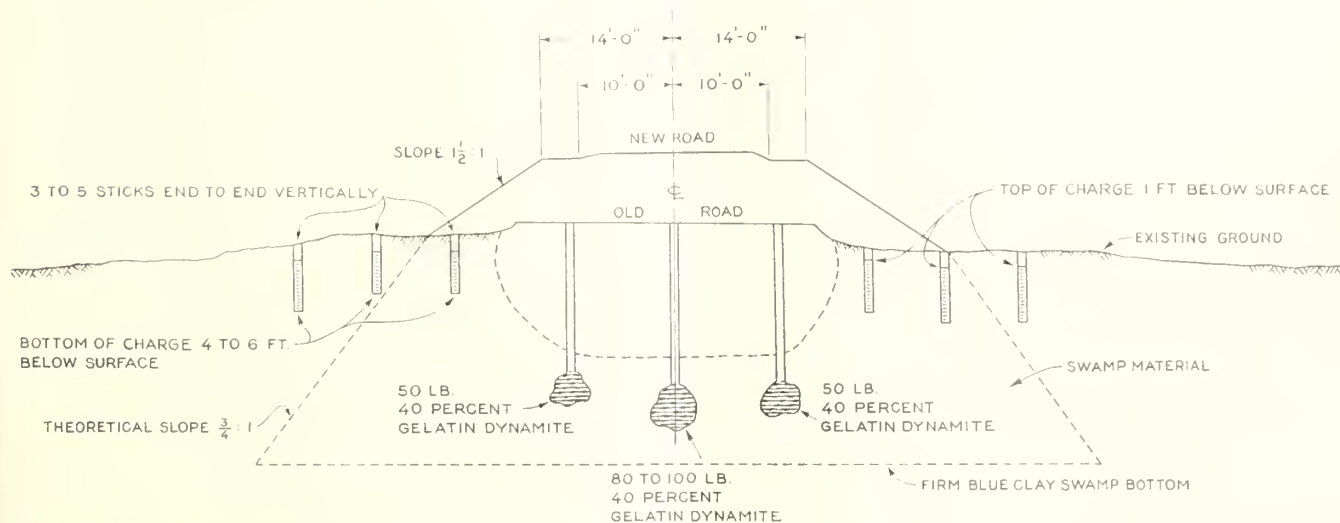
CROSS SECTIONS OF THE OLD ROAD AND OF THE NEW ROAD, SHOWING THE TRANSVERSE POSITION AND DEPTH OF CHARGES FOR SWAMP MAT AND UNDERFILL BLASTING.
